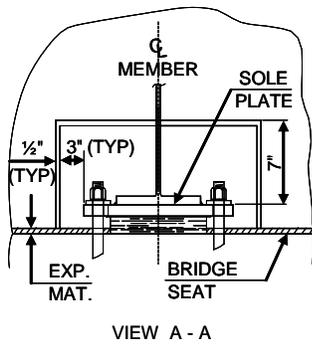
2 Elevation Detail along Curtain Wall for Bearing Box Out
